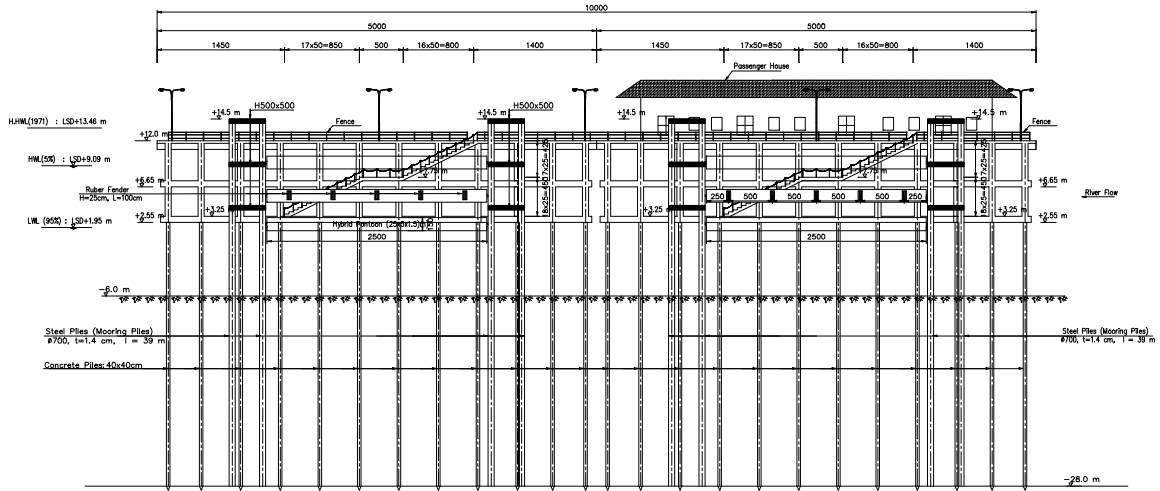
(1) Typical Cross Section of Hanoi Port Passenger Berth
